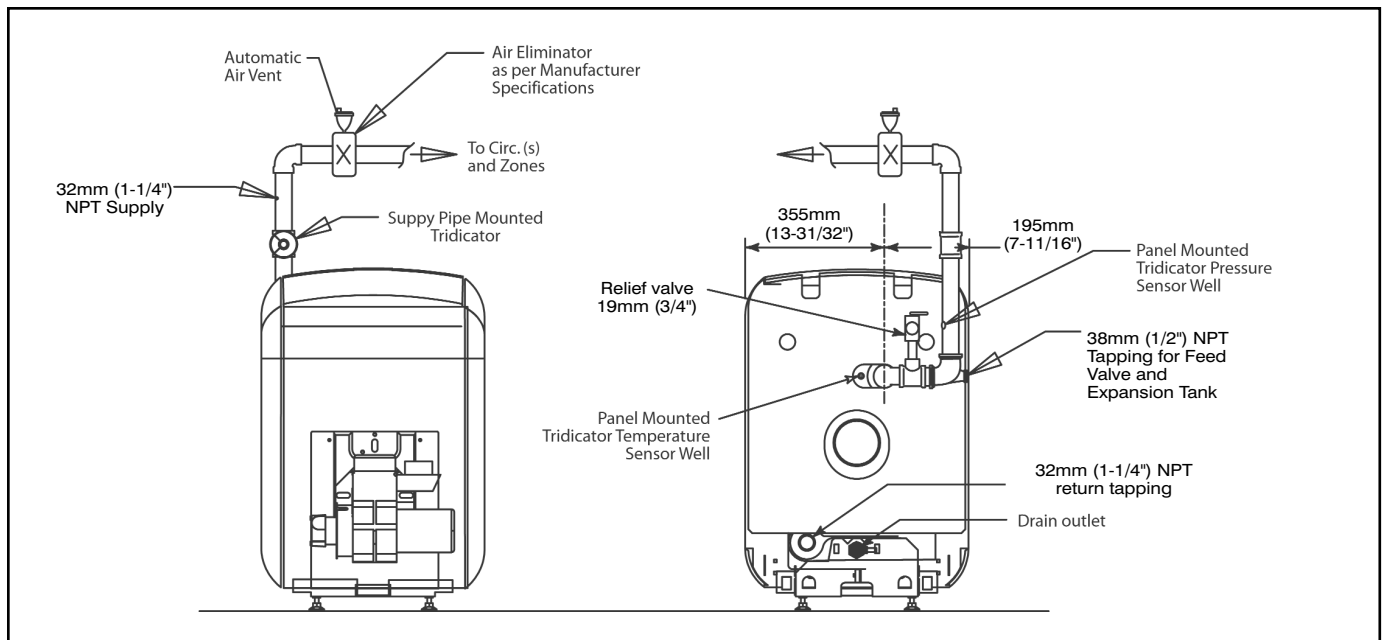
Air Eliminating System or Air Collecting System. Pipe off the relief valve and drain outlet to a safe place.
